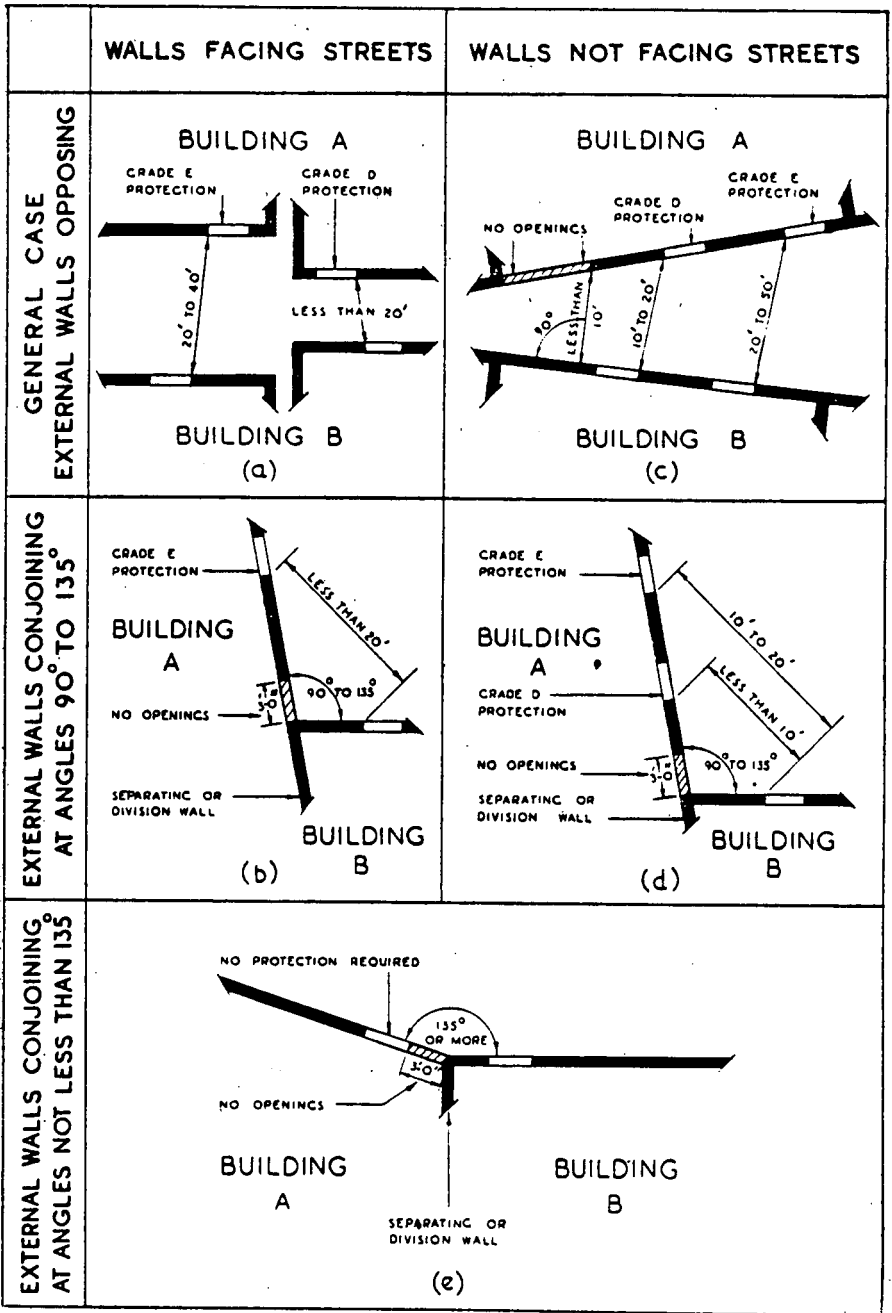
PROTECTION OF OPENINGS IN EXTERNAL WALLS BUILDINGS (OR DIVISIONS) OF HIGH, MODERATE, OR LOW (ABNORMAL) FIRE LOAD OCCUPANCY
